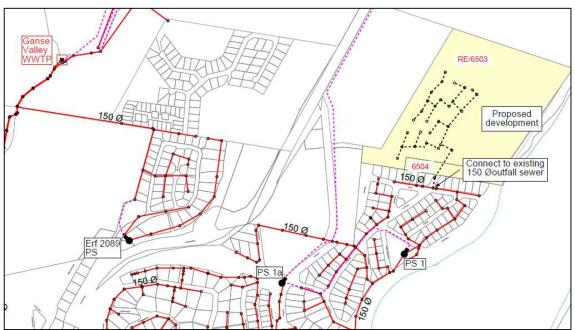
Extract from GLS Consulting (Feb 2023) Figure 4: External Sewer Masterplan
